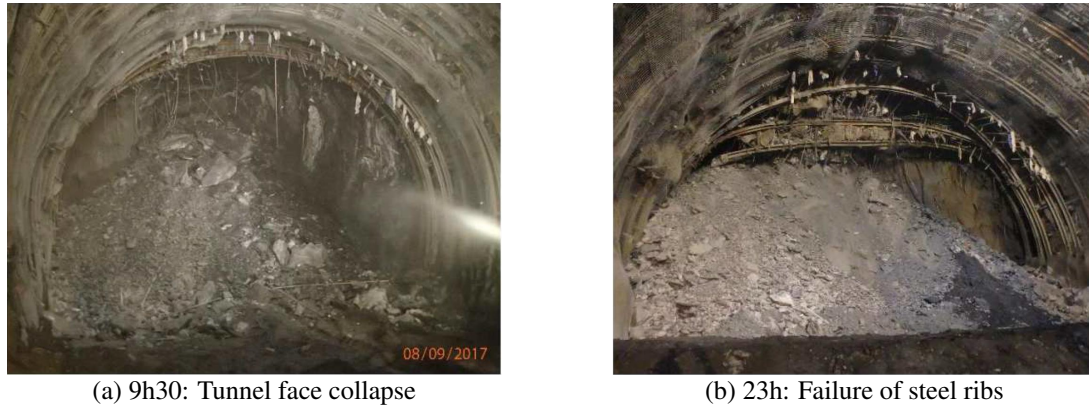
Tunnel face collapse occurred near chainage 10303 m
